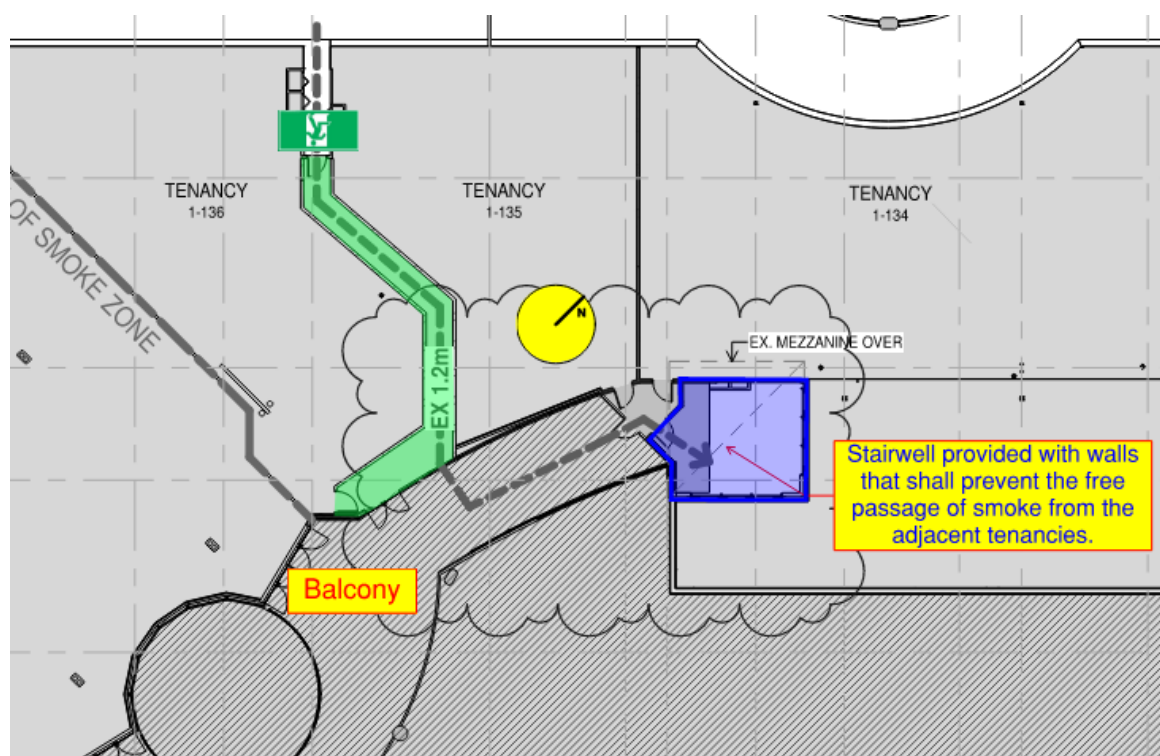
Walls that shall prevent the free passage of smoke on First Floor
